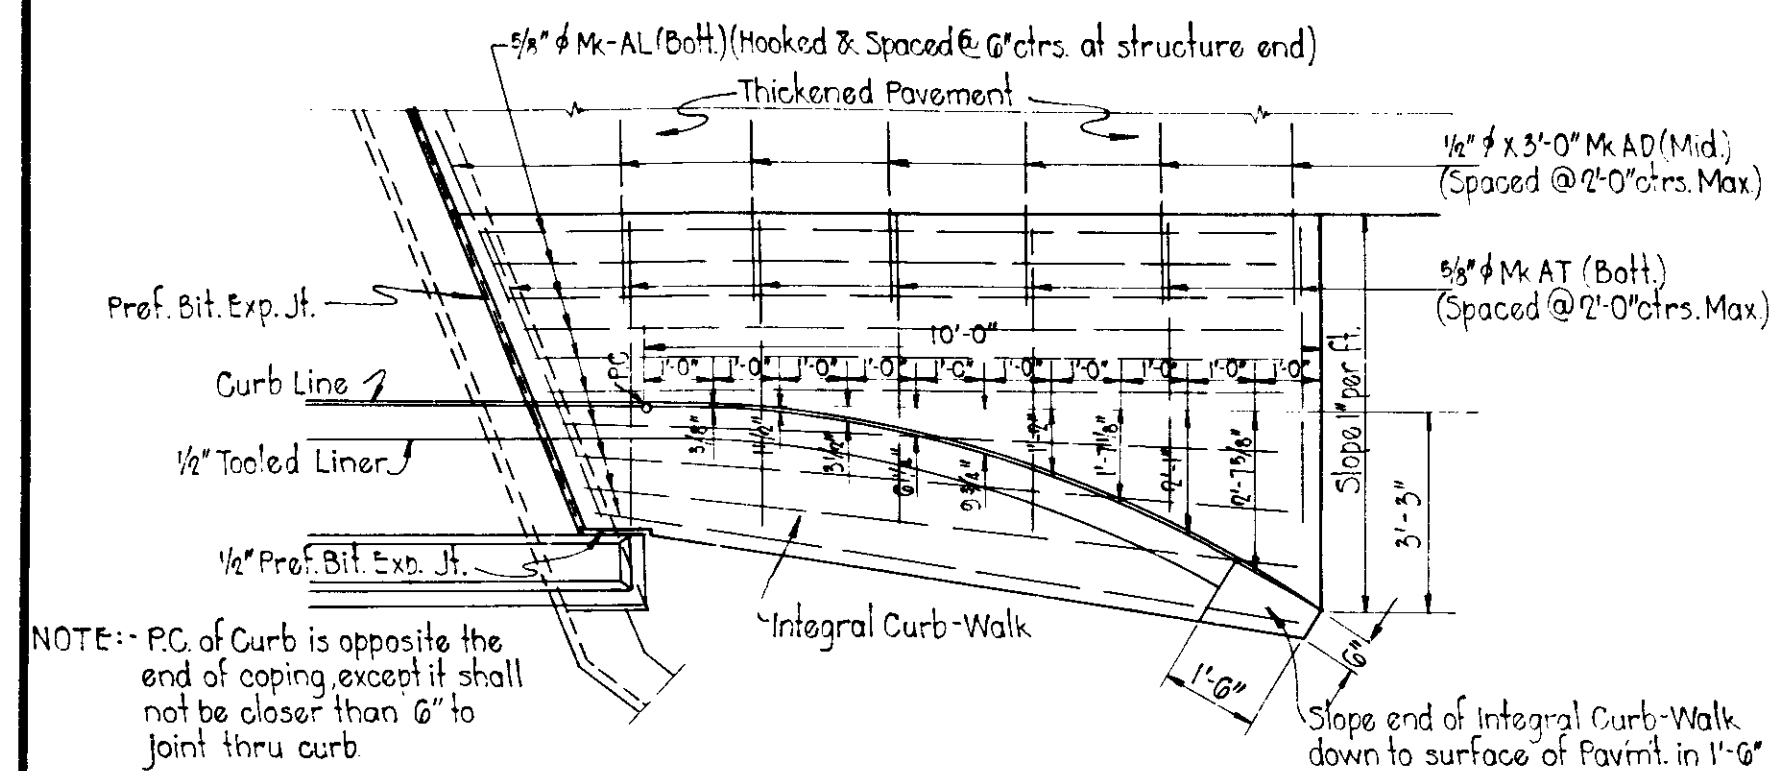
DETAIL OF TRANSITION FROM 4 LANE DIVIDED TO 4 LANE UNDIVIDED
